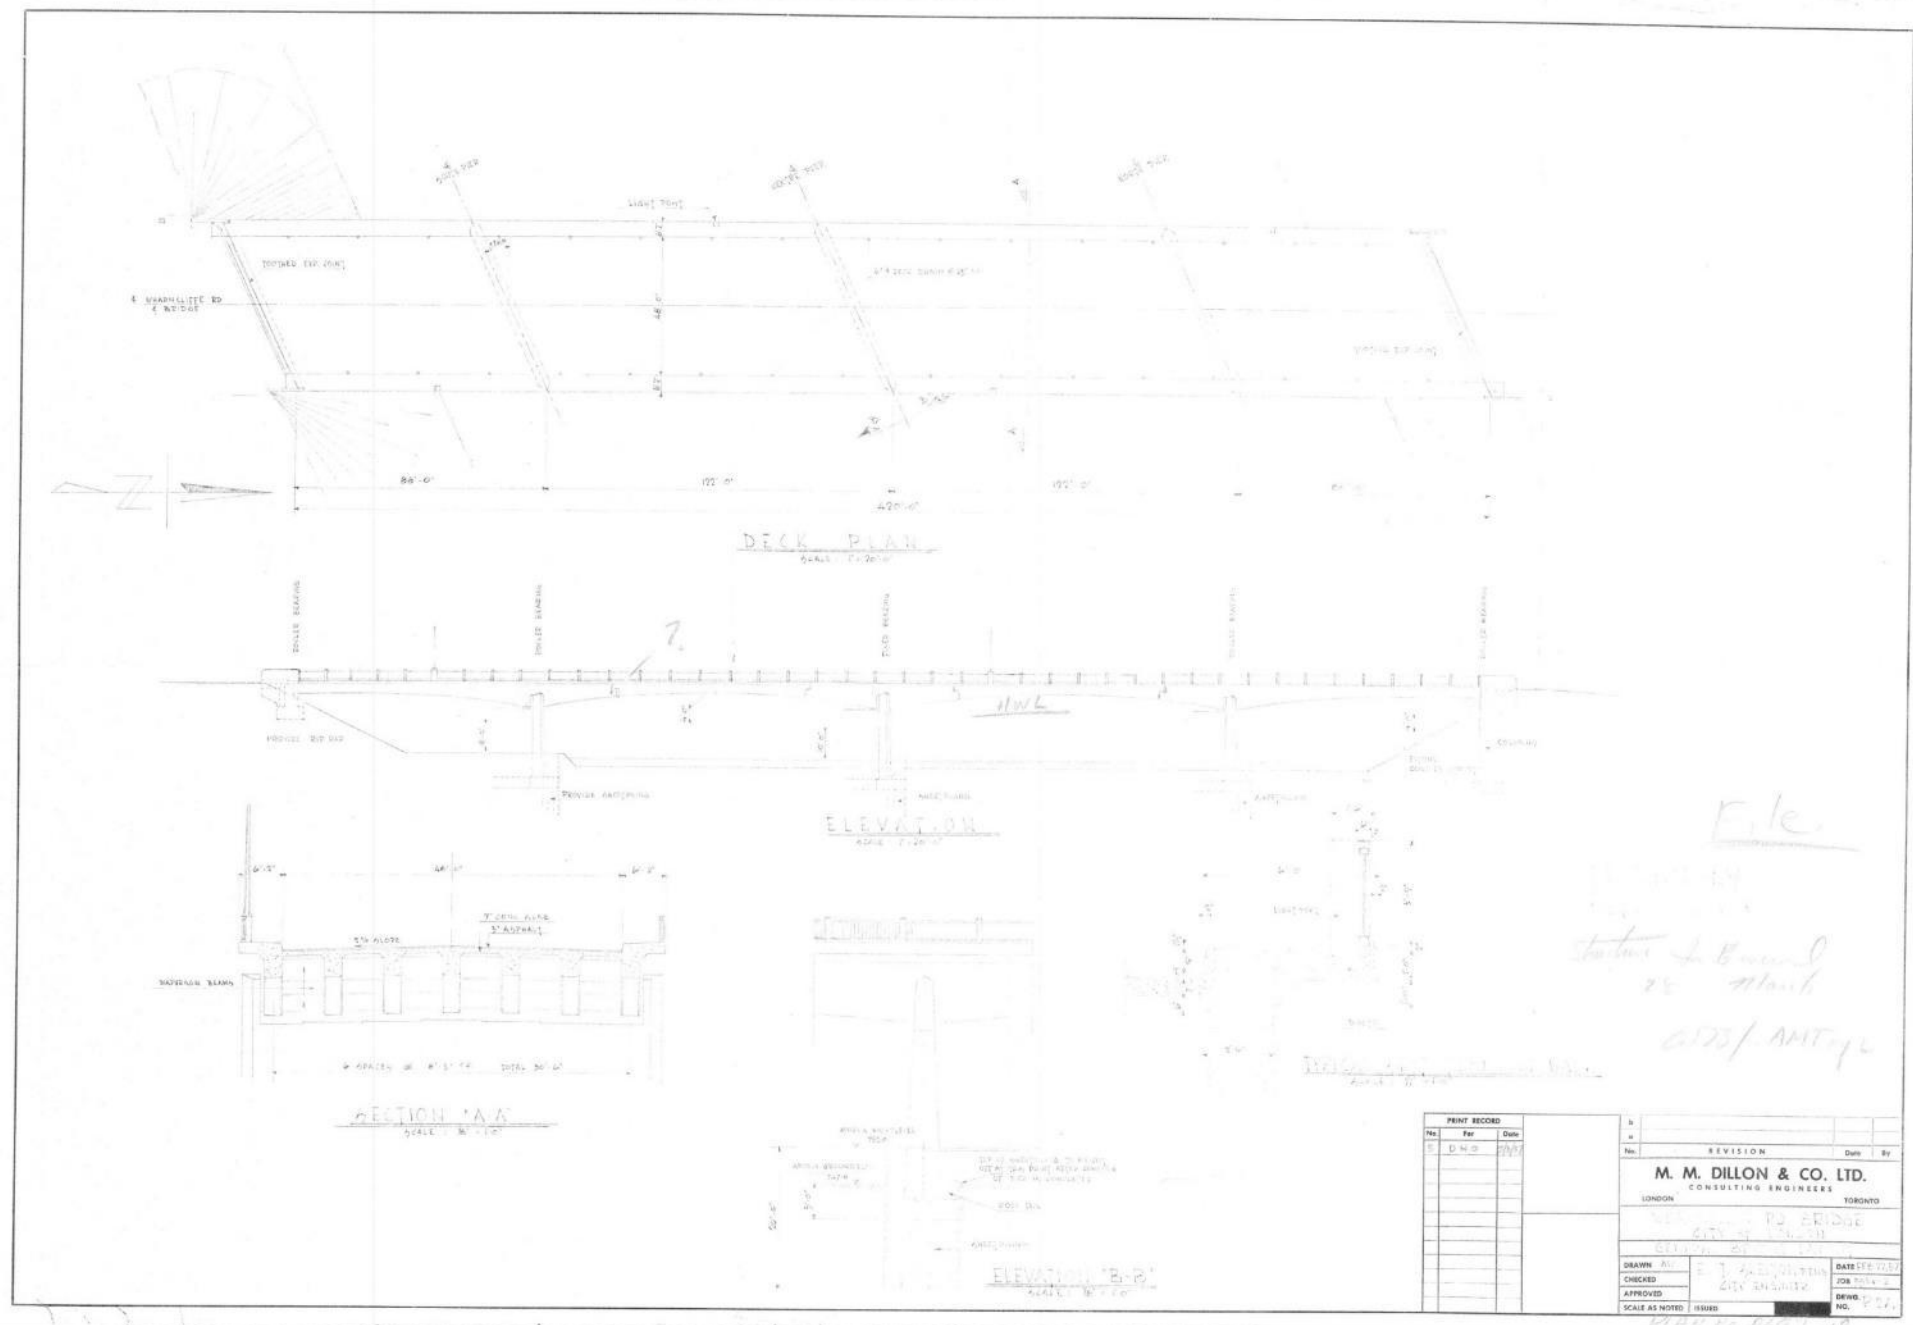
Deck Plan of Wharncliffe Road Bridge, 1957
